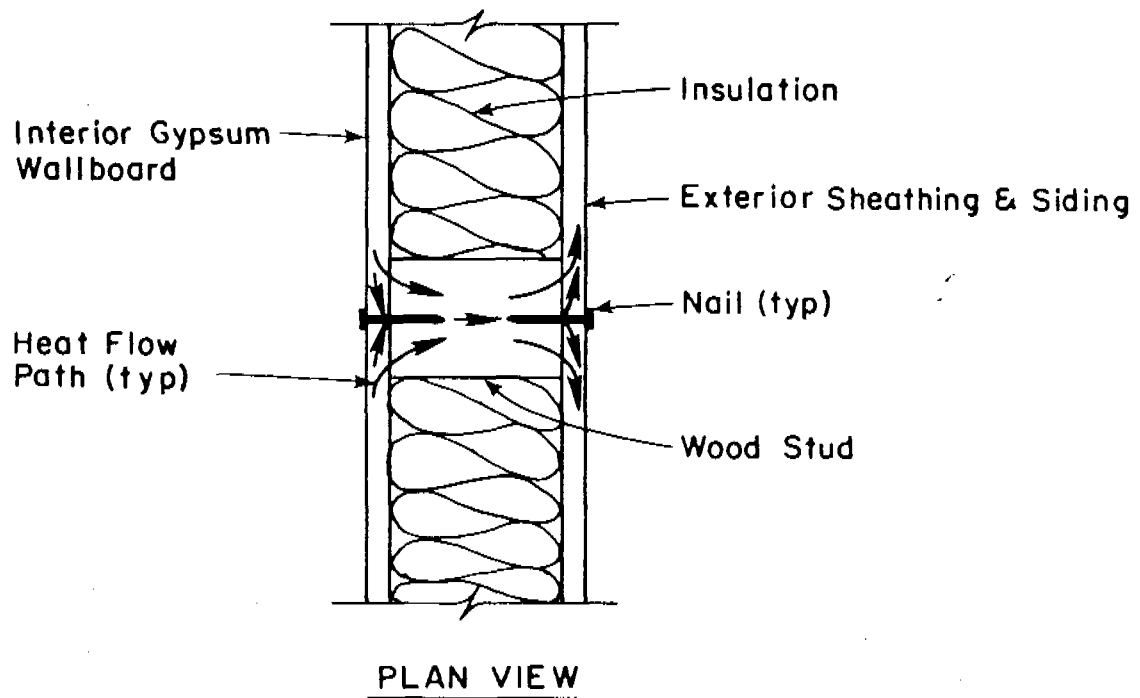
Thermal Bridge Through Insulated Frame Wall (Adapted from Ref. 5)
